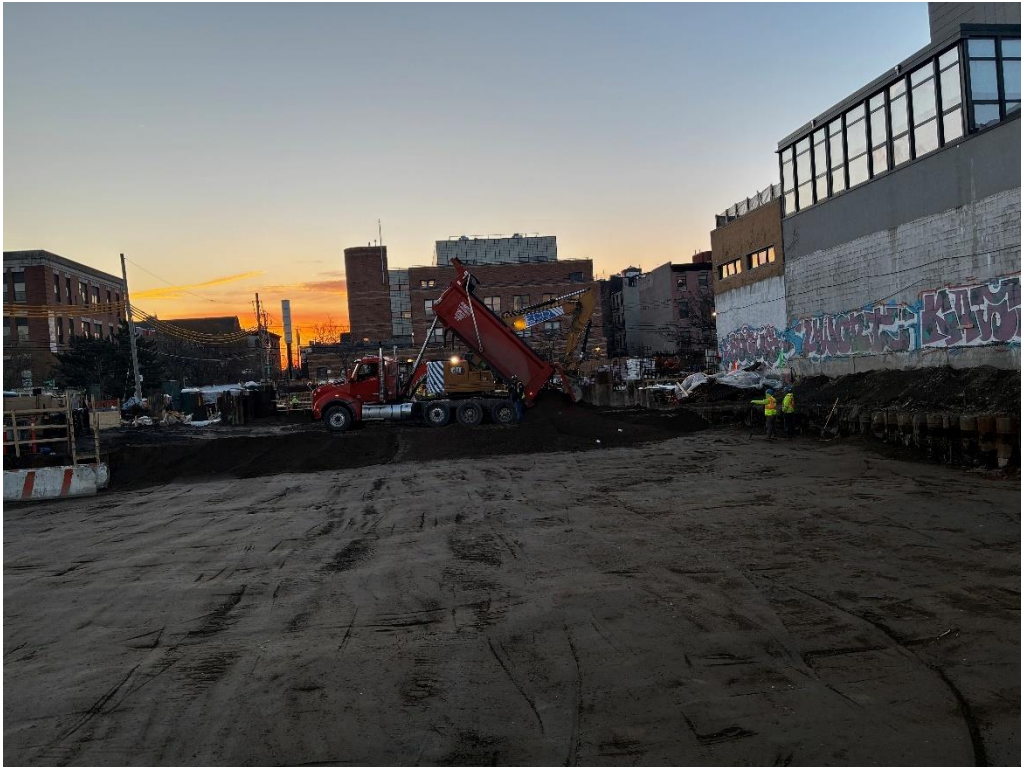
ECD importing clean fill in the central part of site (facing southwest)
